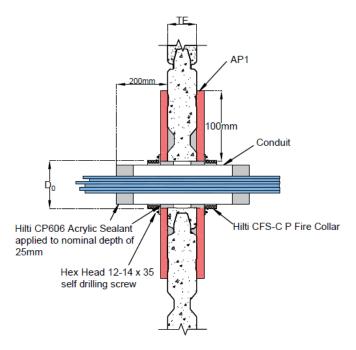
Flexible conduits < 50 mm in Dia. through 78 mm Korok wall system with AP1 additional protection.
